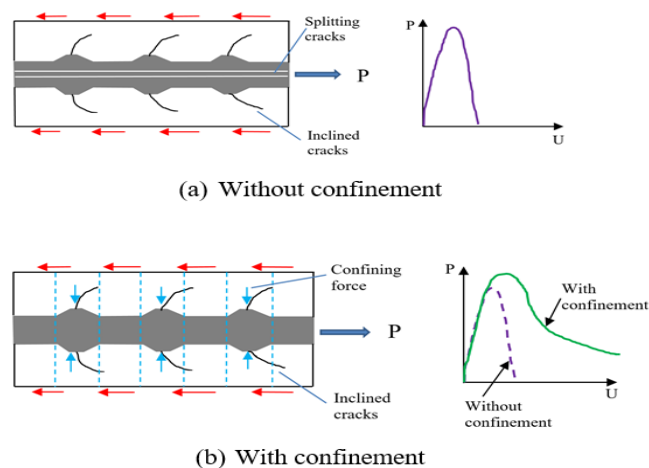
Failures in concrete specimens; with and without confinement [5]
